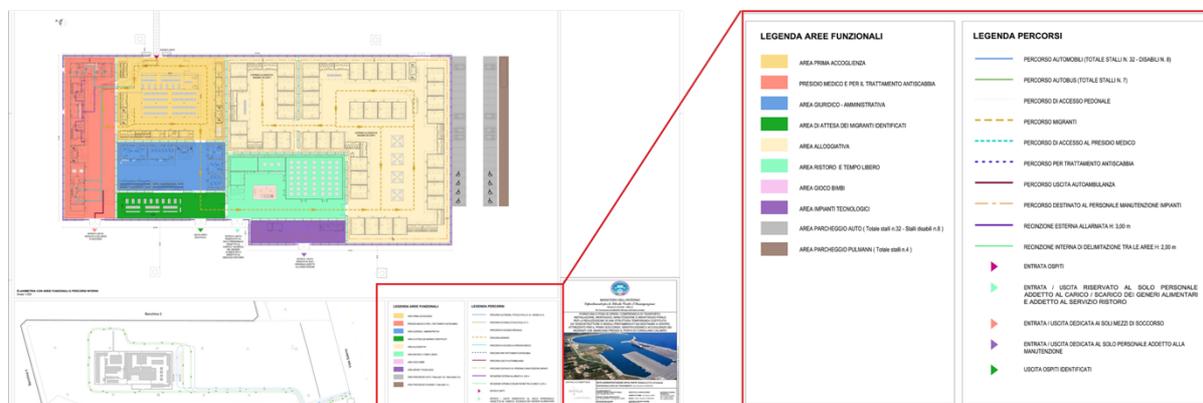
Architectural plans for a new hotspot facility in Corigliano Calabro (Source: Invitalia website published on 13.12.2017).
